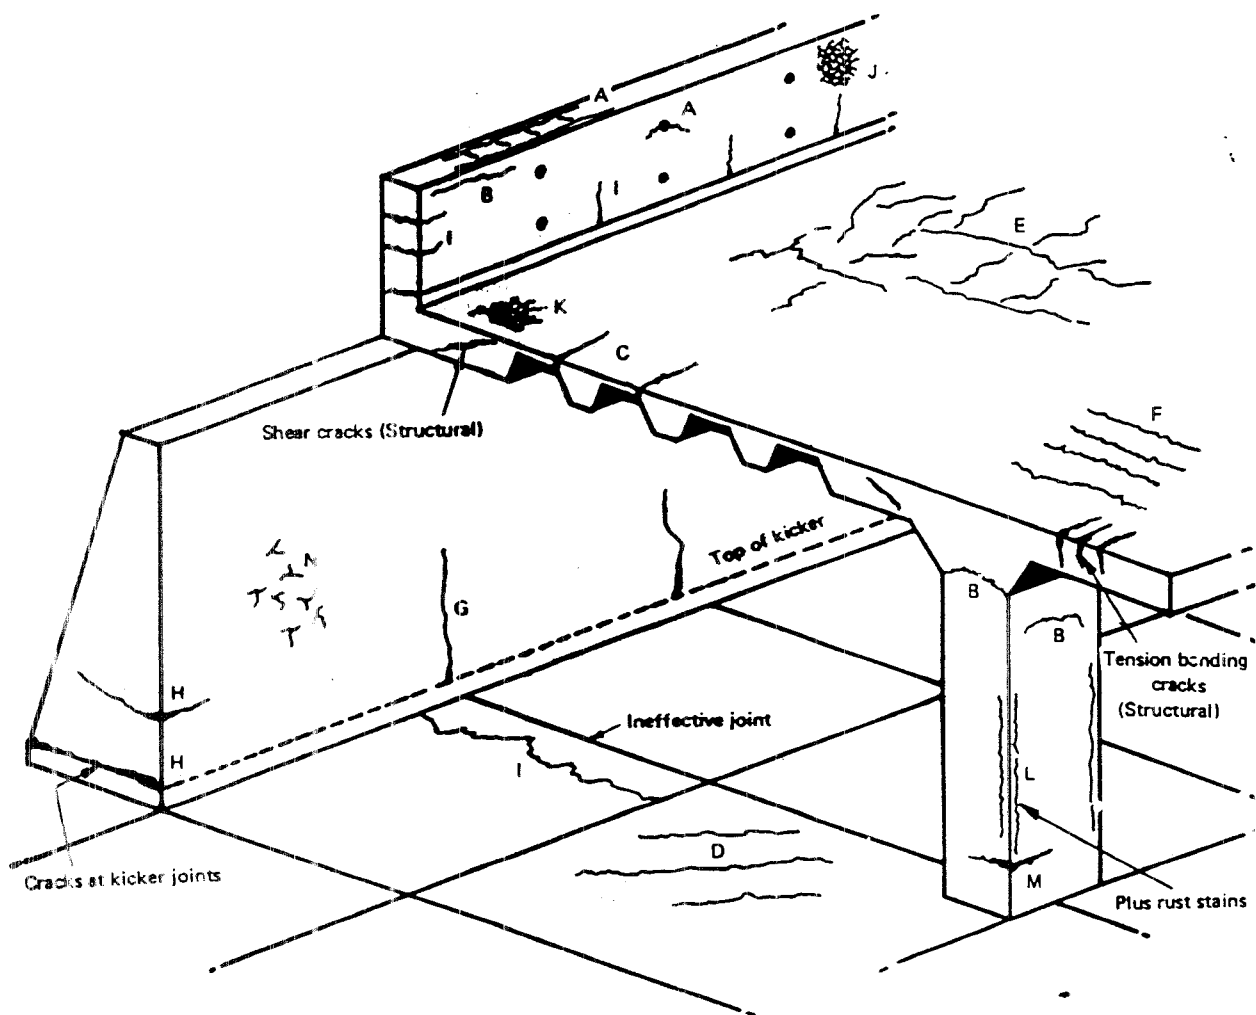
Examples of cracks in a hypothetical concrete structure. Redrawn and adapted from Concrete Society [77]
